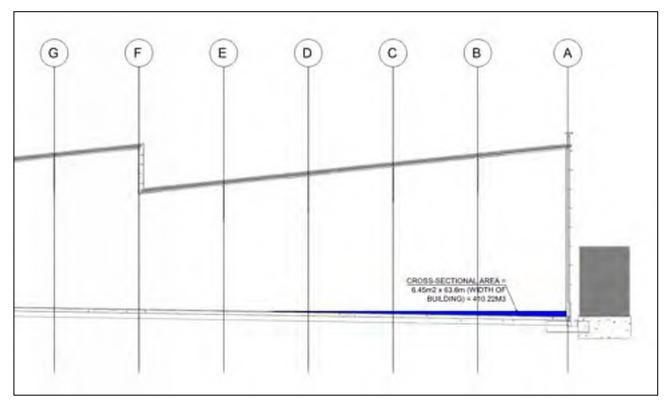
South to north cross section through building showing 410m3 spent fire water volume.
